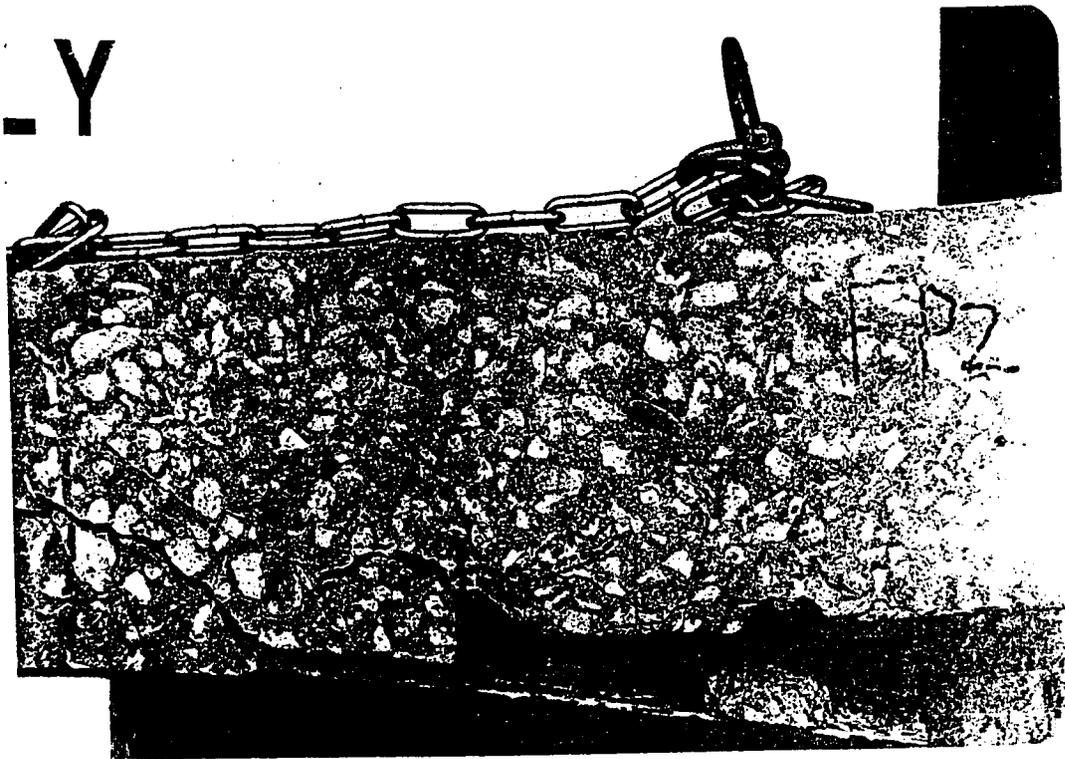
Failure Mode of Beam FP2 (Separation of the Plate and the Concrete cover Followed by crushing of Concrete).
